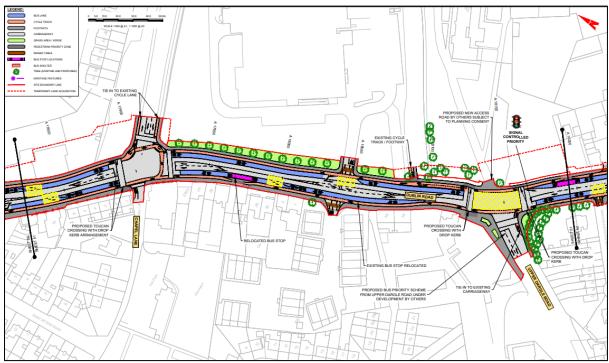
Extract from General Arrangement Drawings at Dublin Road, Bray (Sheet 51)
